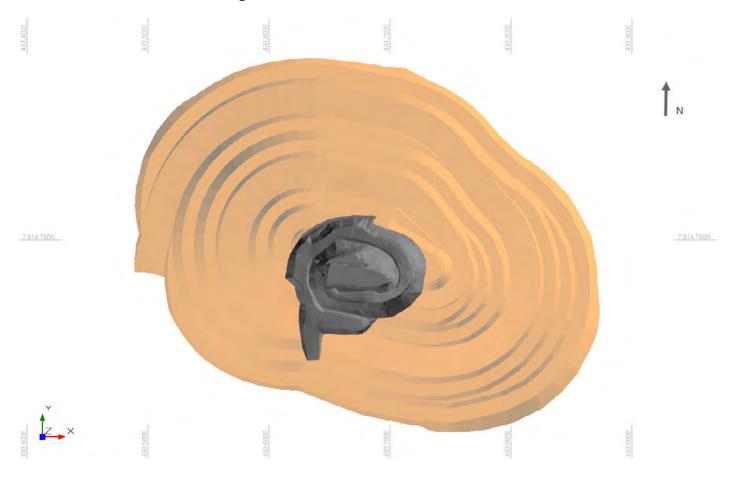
Wolverine open pit design plan view (trial pit shown in grey)
